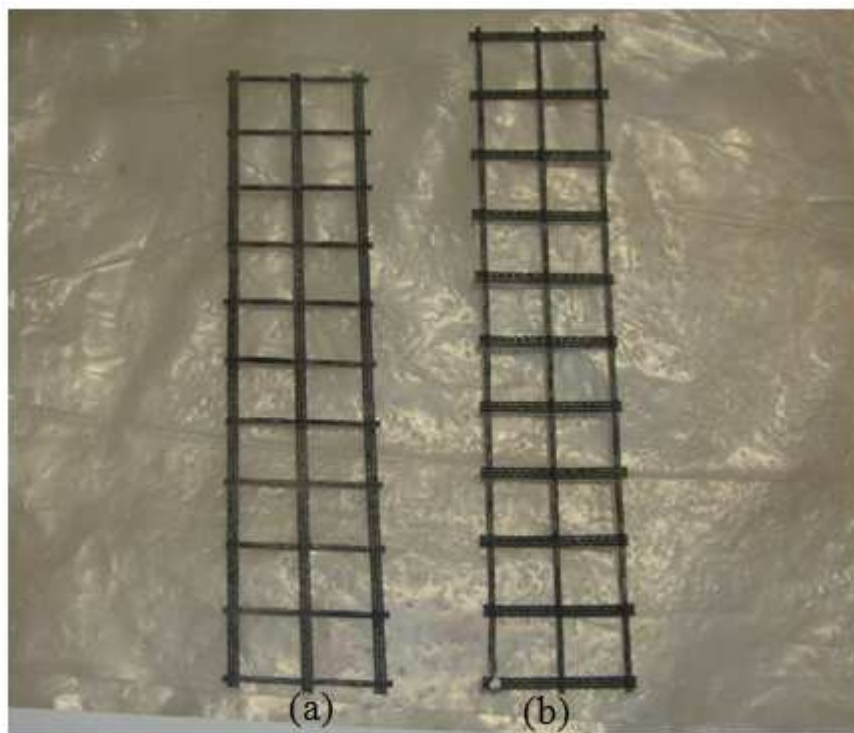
Damaged KGG1 geogrid rib strength test specimens before the test: (a) MD specimens, (b) XD specimens
